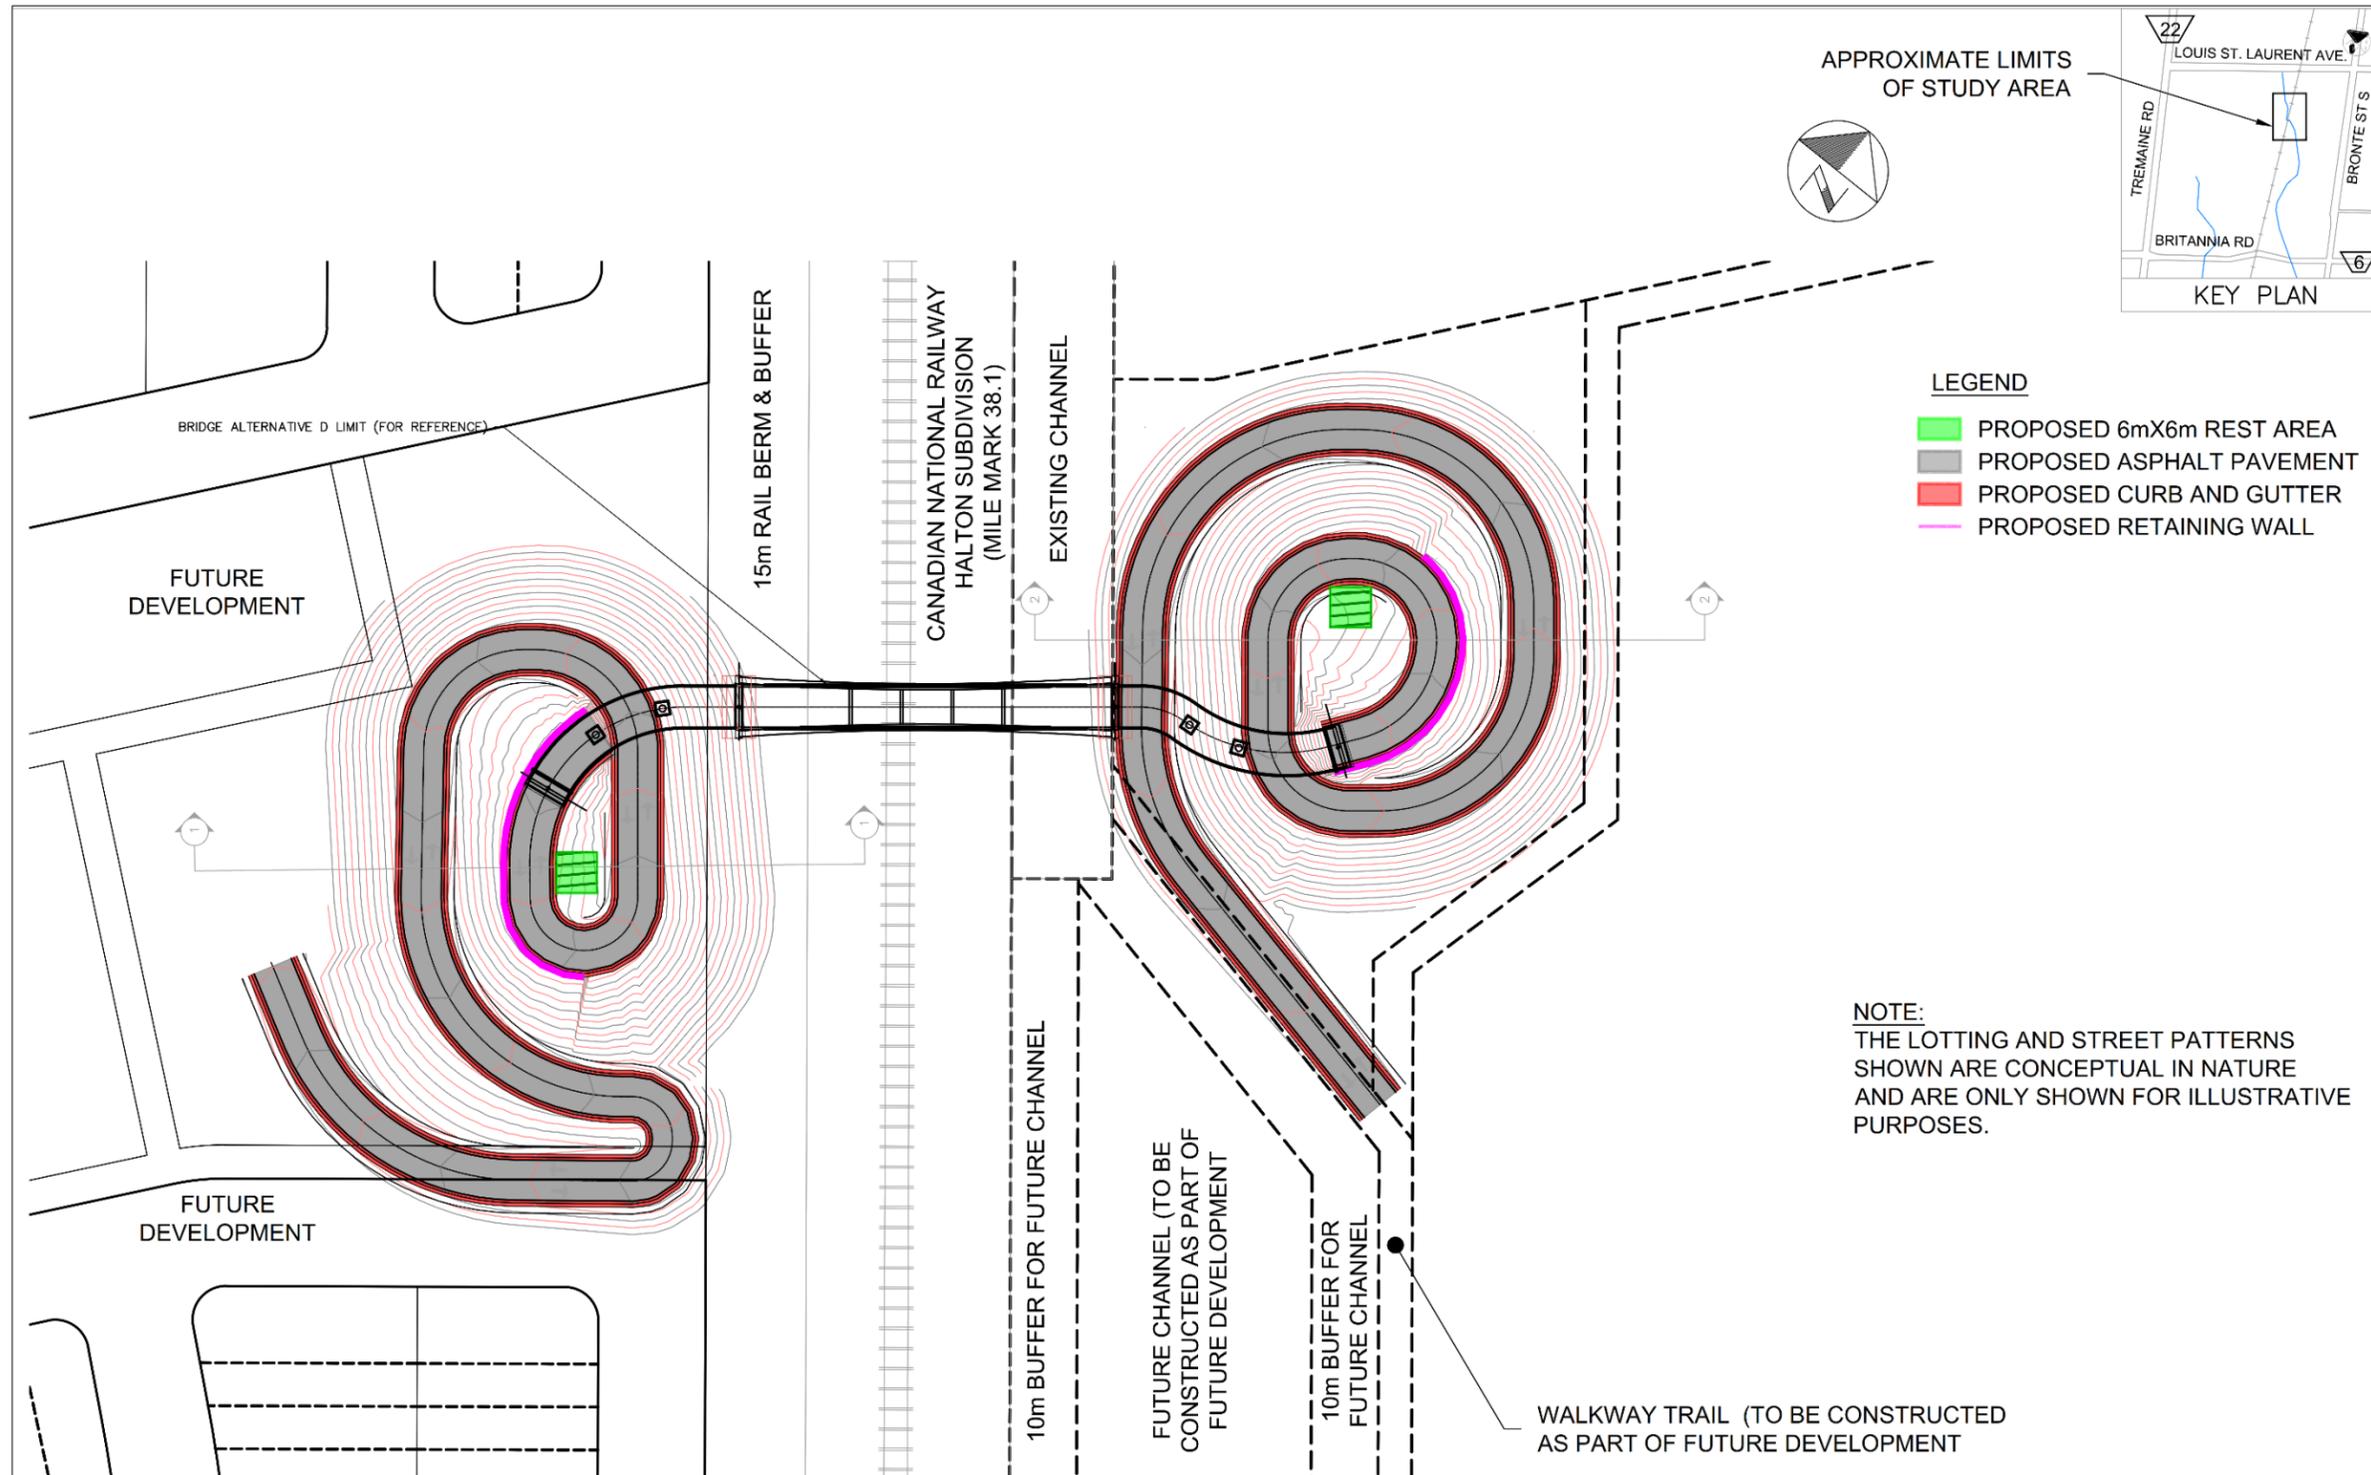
Bridge Approach Alternative 2 - "S" Shaped Approach
